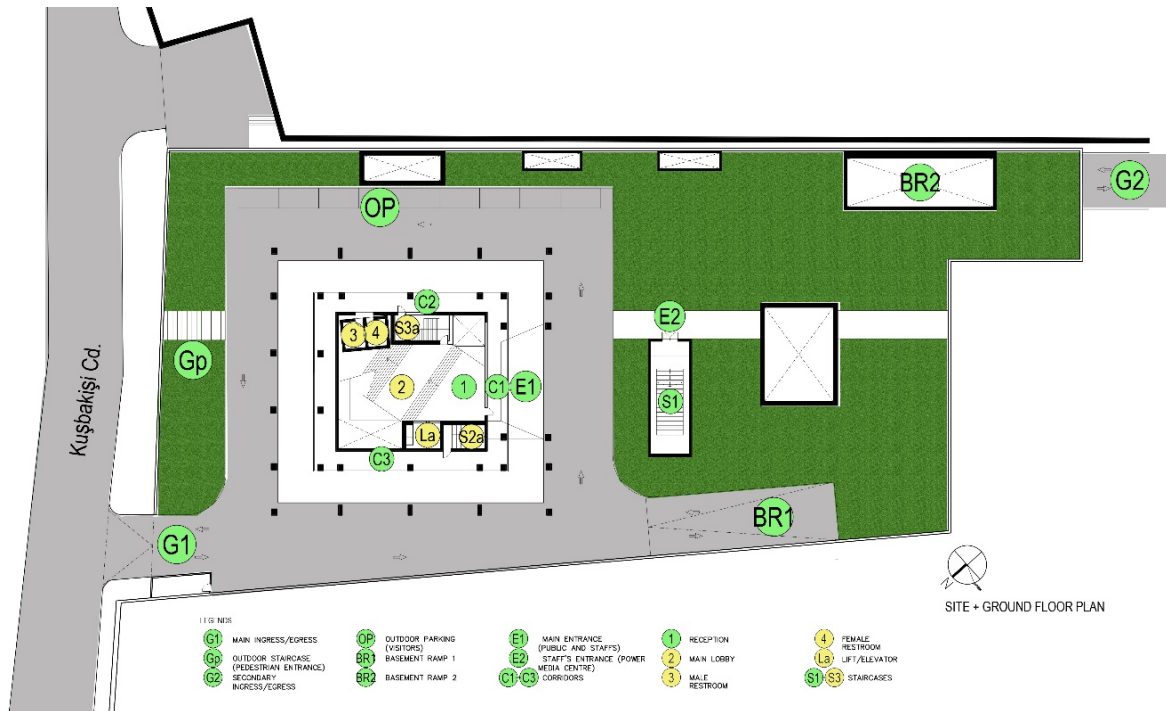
Site Plan and Ground Floor Plan is redrawn from the original copy.
